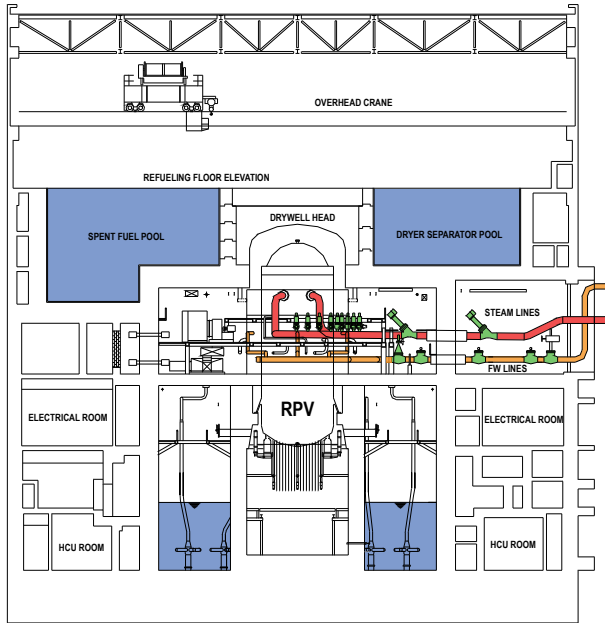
ABWR Reactor Building 0-180° Elevation
